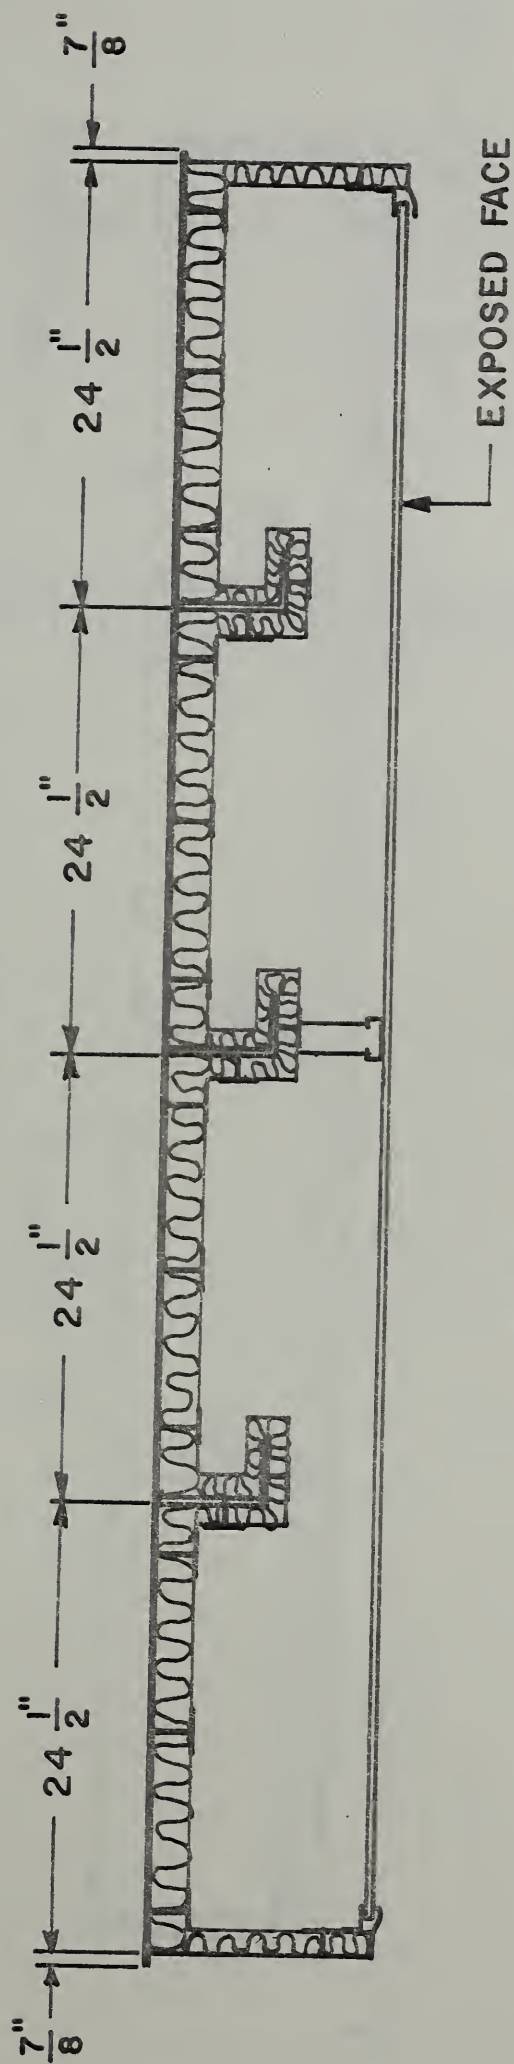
DETAILS OF WALL-TESTING FURNACE.
